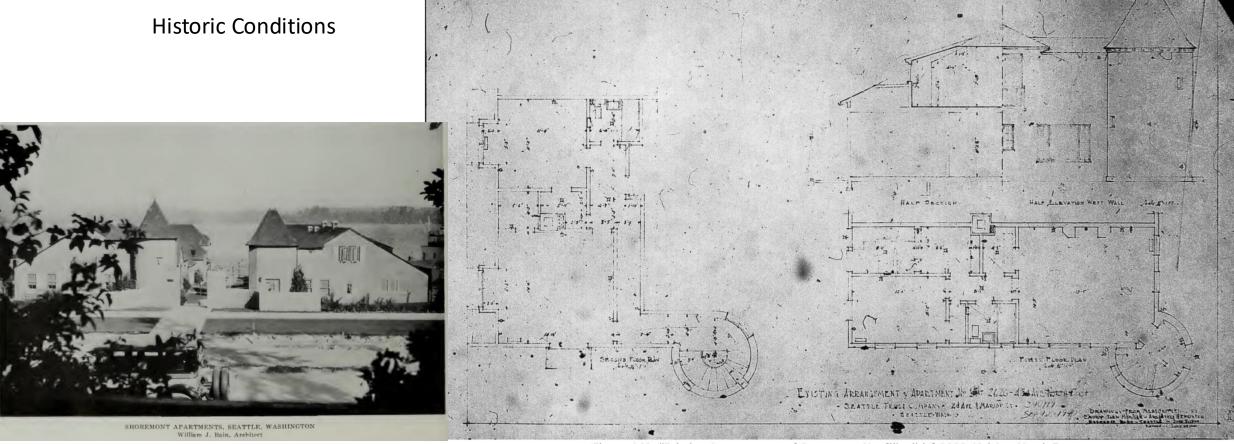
"Existing Arrangement of Apartment No. [illegible] 2020 43d Ave North East Seattle Trust Company ... [Building Permit] 340119, Sep 12 1940"
